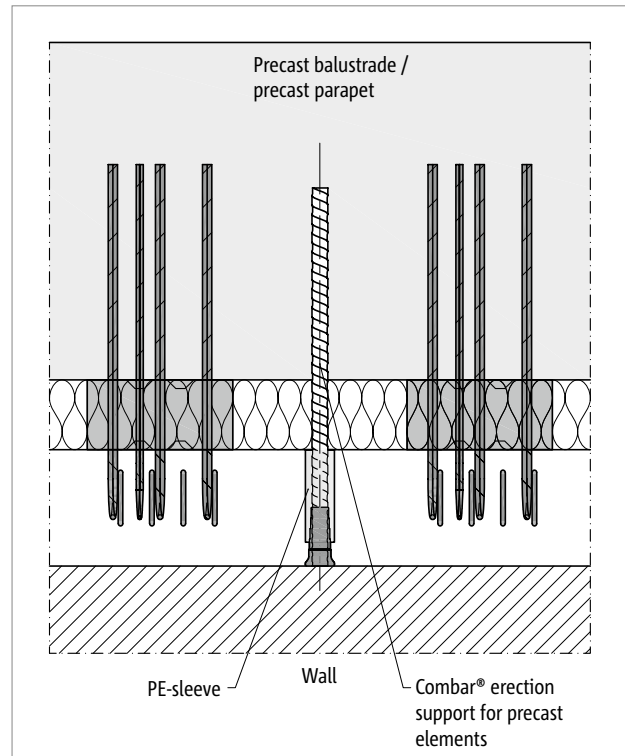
Schöck Combar® erection support for precast elements: Installation in a precast concrete parapet; view
